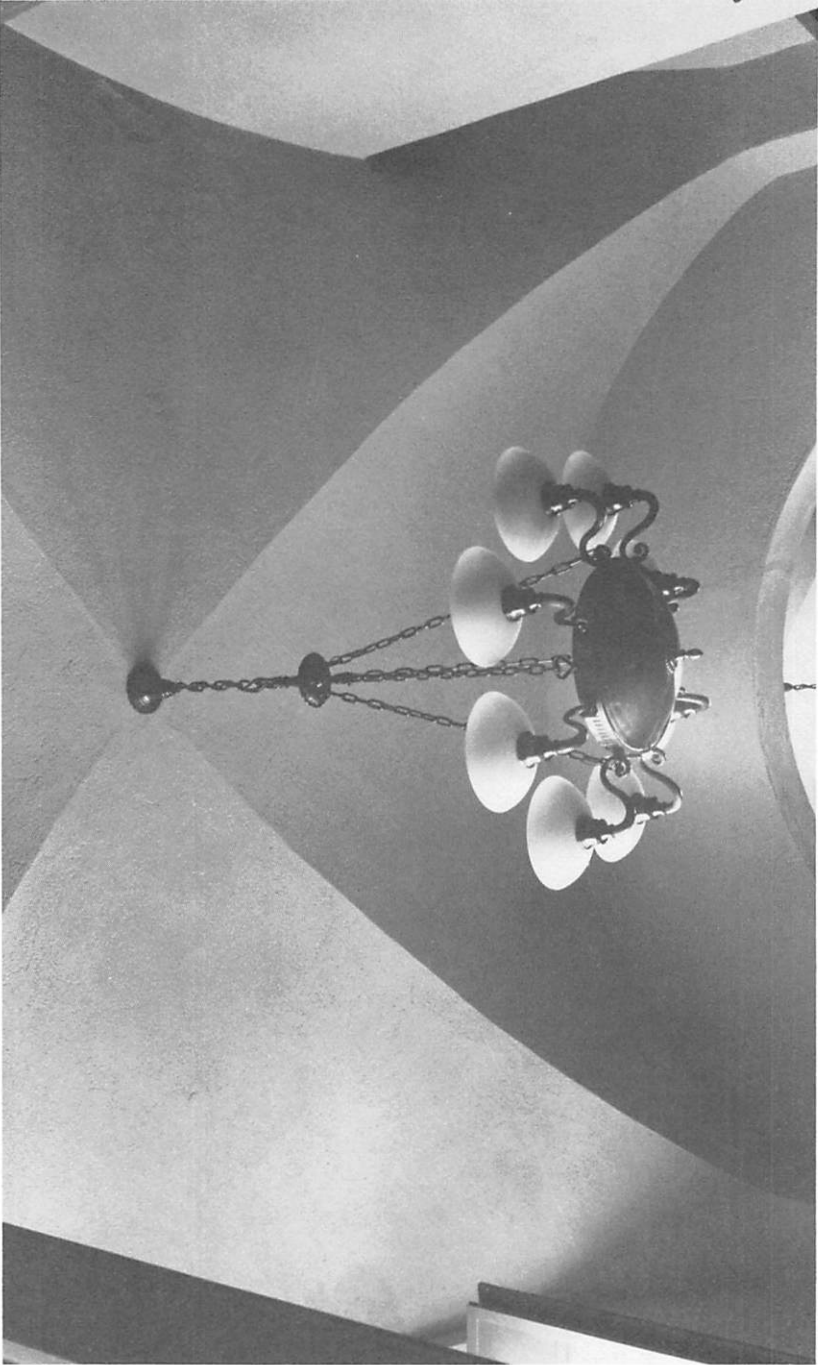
Vaulting of the main floor of the Fireproof Building.
